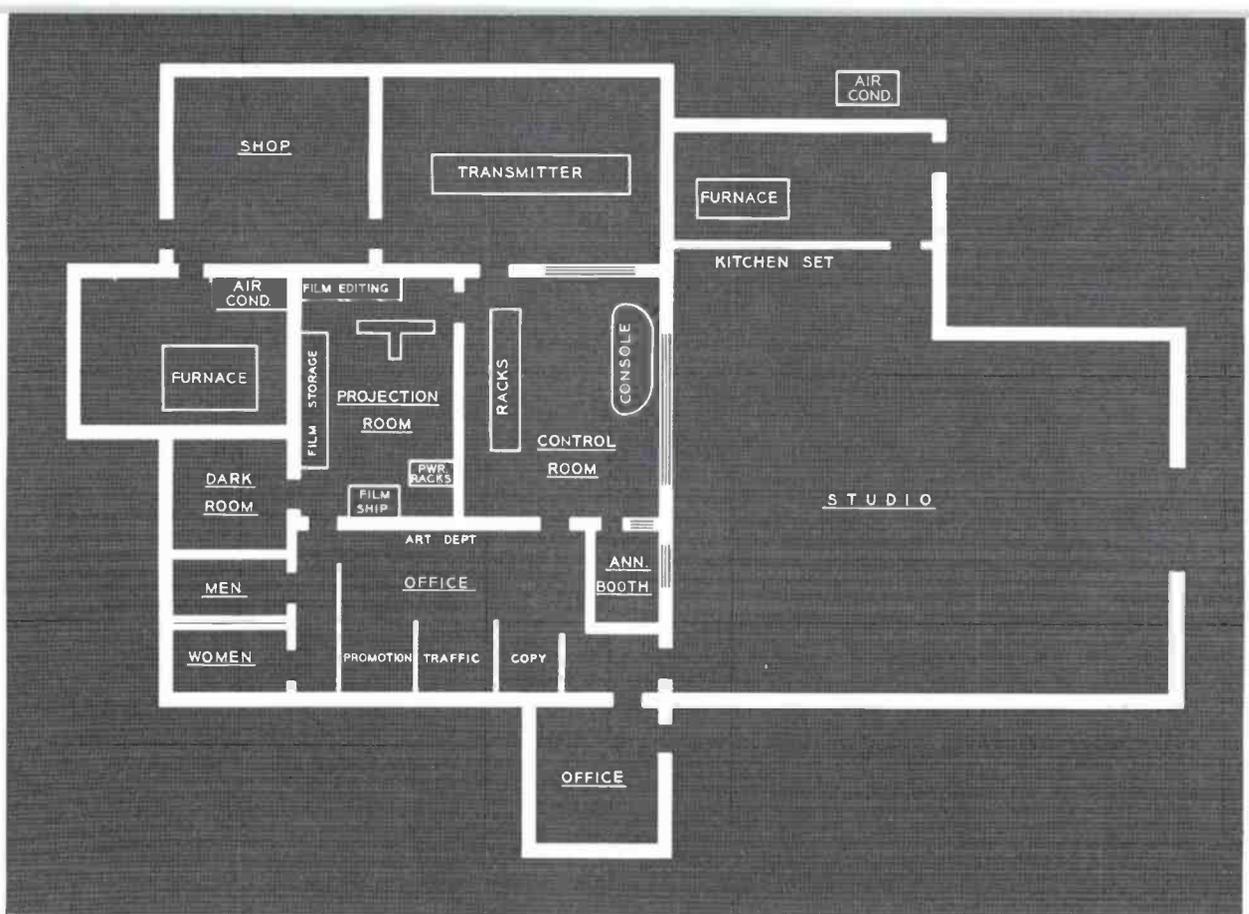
KROC-TV Floor Plan. Large studio door faces east.
